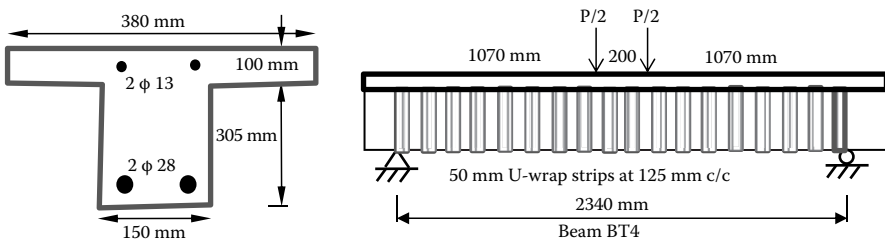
Example 6.5 showing the beam section and profile.
